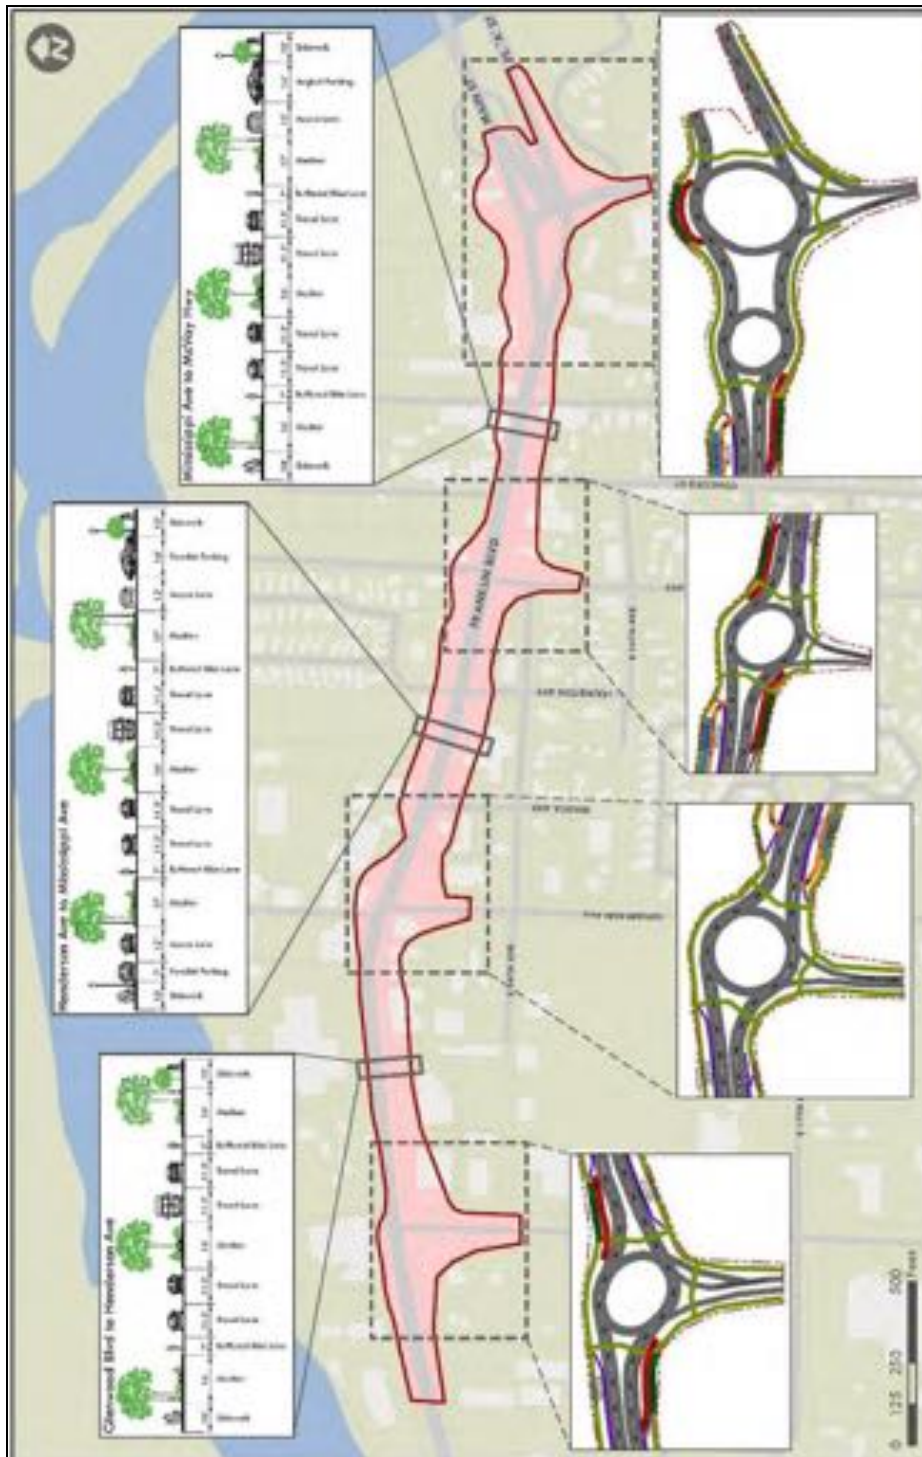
Proposed plan for constructing multiple roundabouts on Franklin Avenue.
